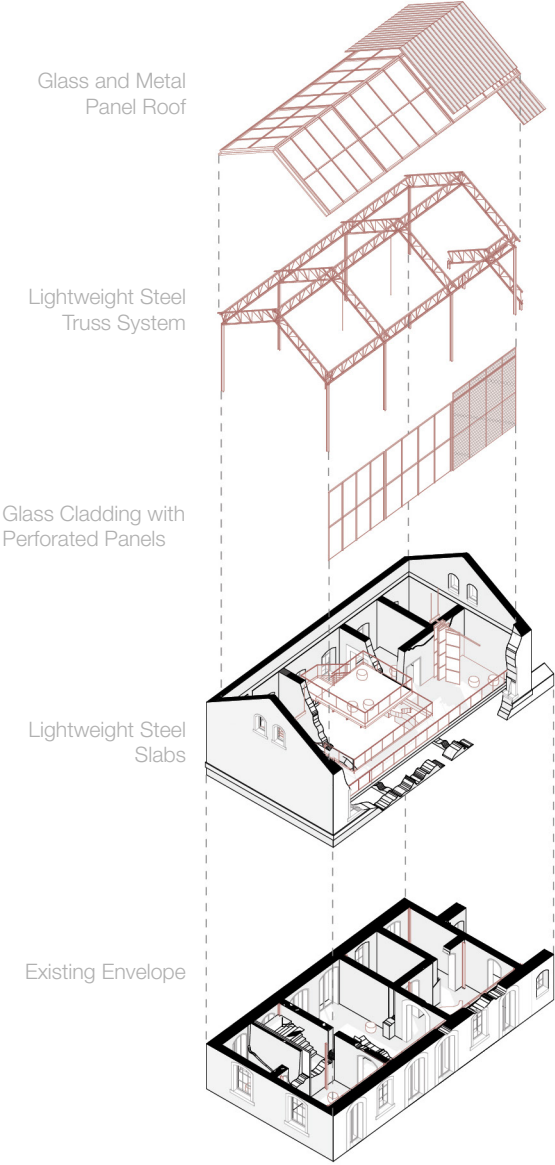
Exploded Axonometry of a Proposed Traveller's Building
